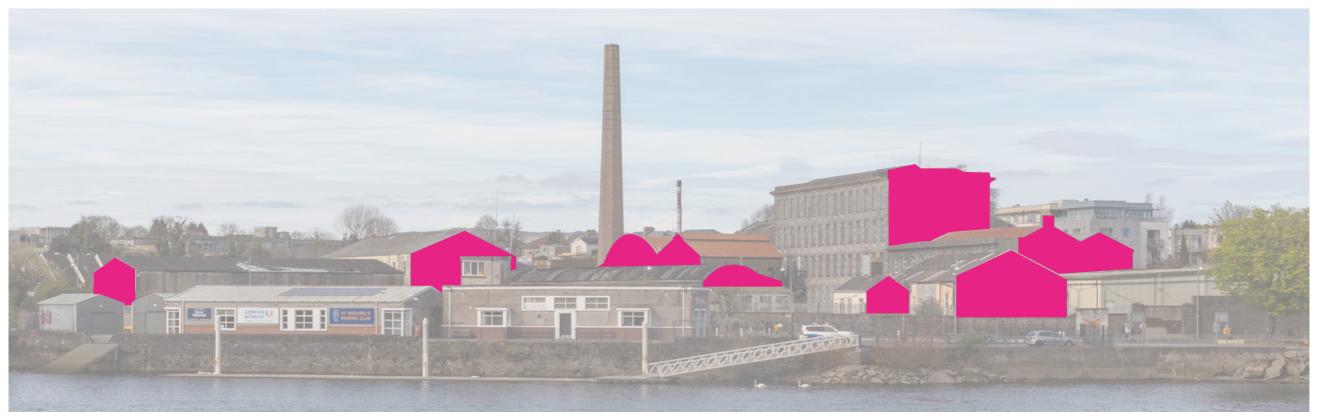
Exisiting site gables with pitched, double pitched and vaulted roofs
